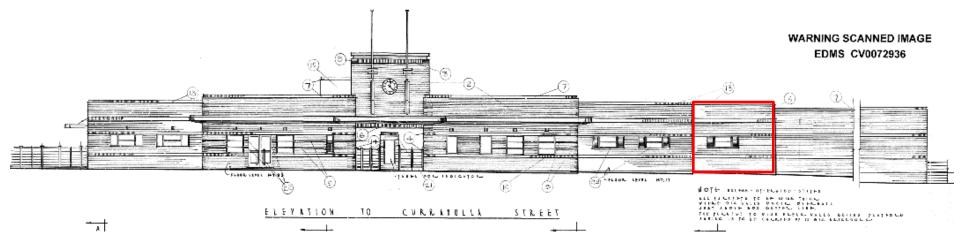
1939 elevation of the Cronulla Station Building, with study area outlined in red (Source: Sydney Trains Plan Room, CV0072936).
